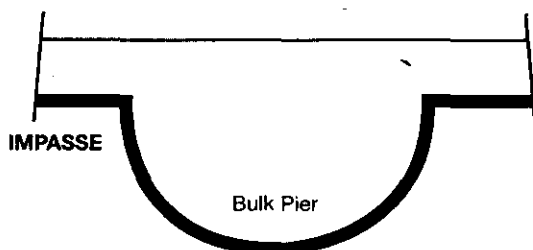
Shows position of Impasse Barrier fitted to bulk piers.
